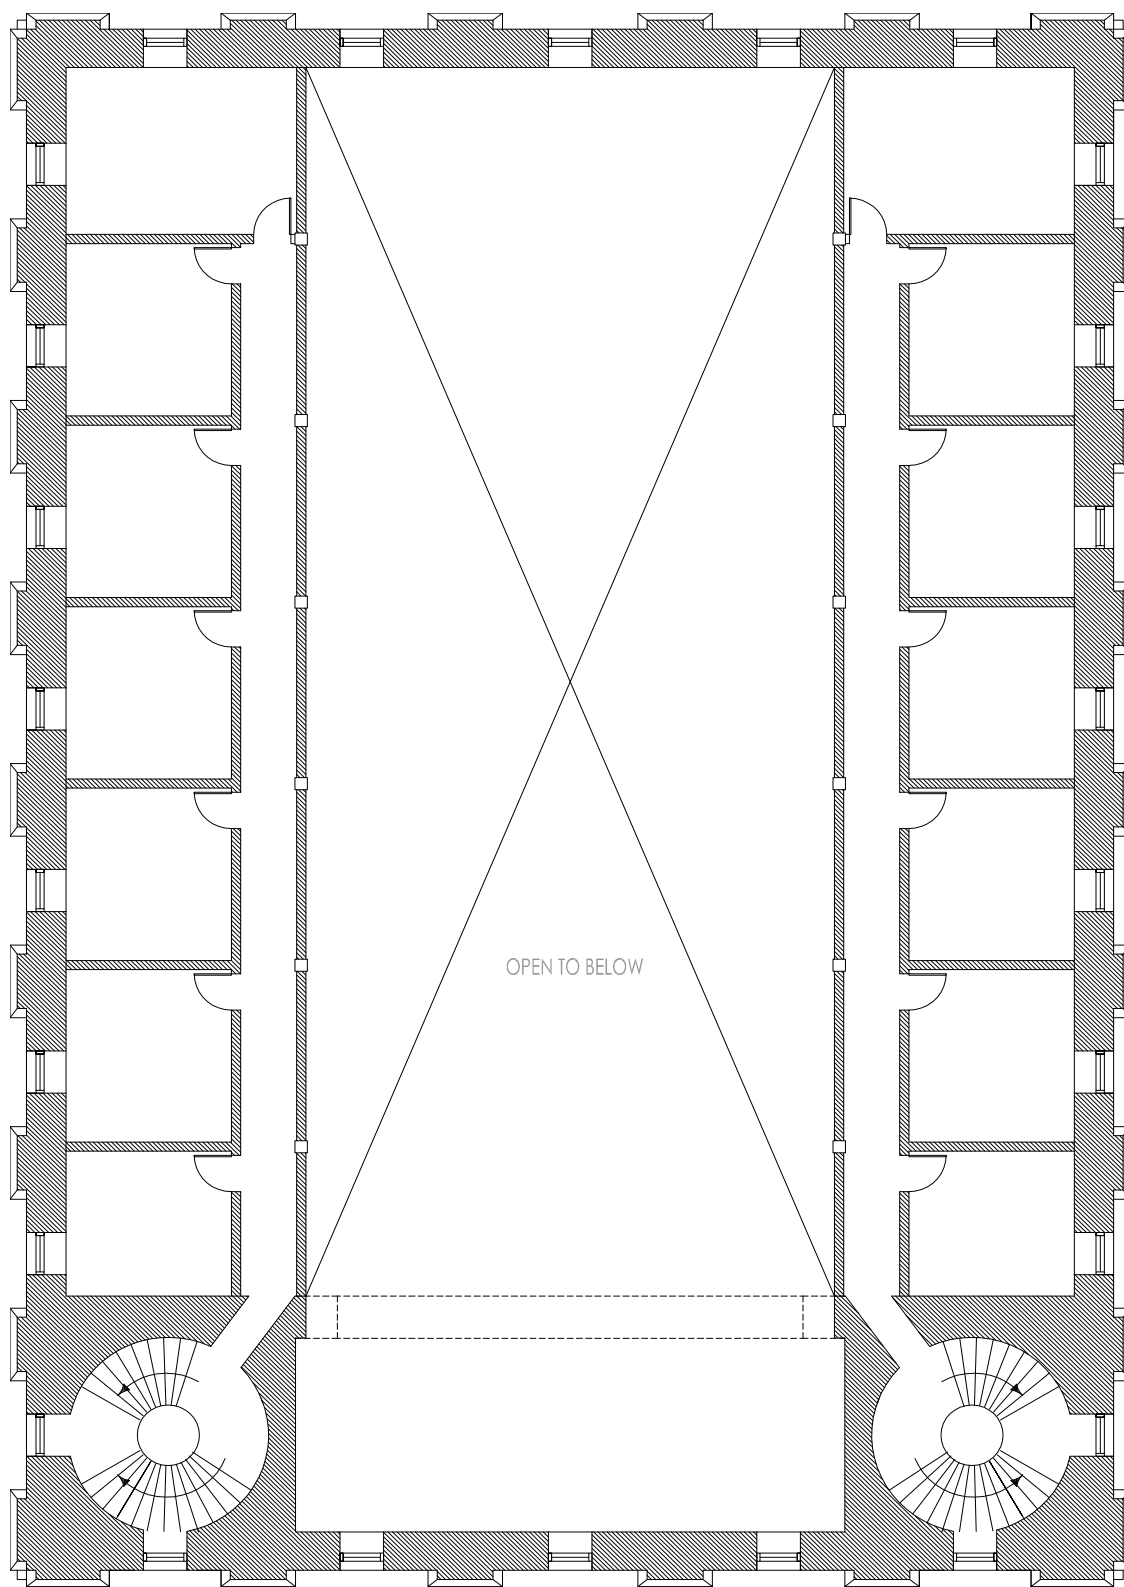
Second floor mezzanine plan based on Lisle Brown and FFKR Architects reconstruction drawings. Drawn by author.
